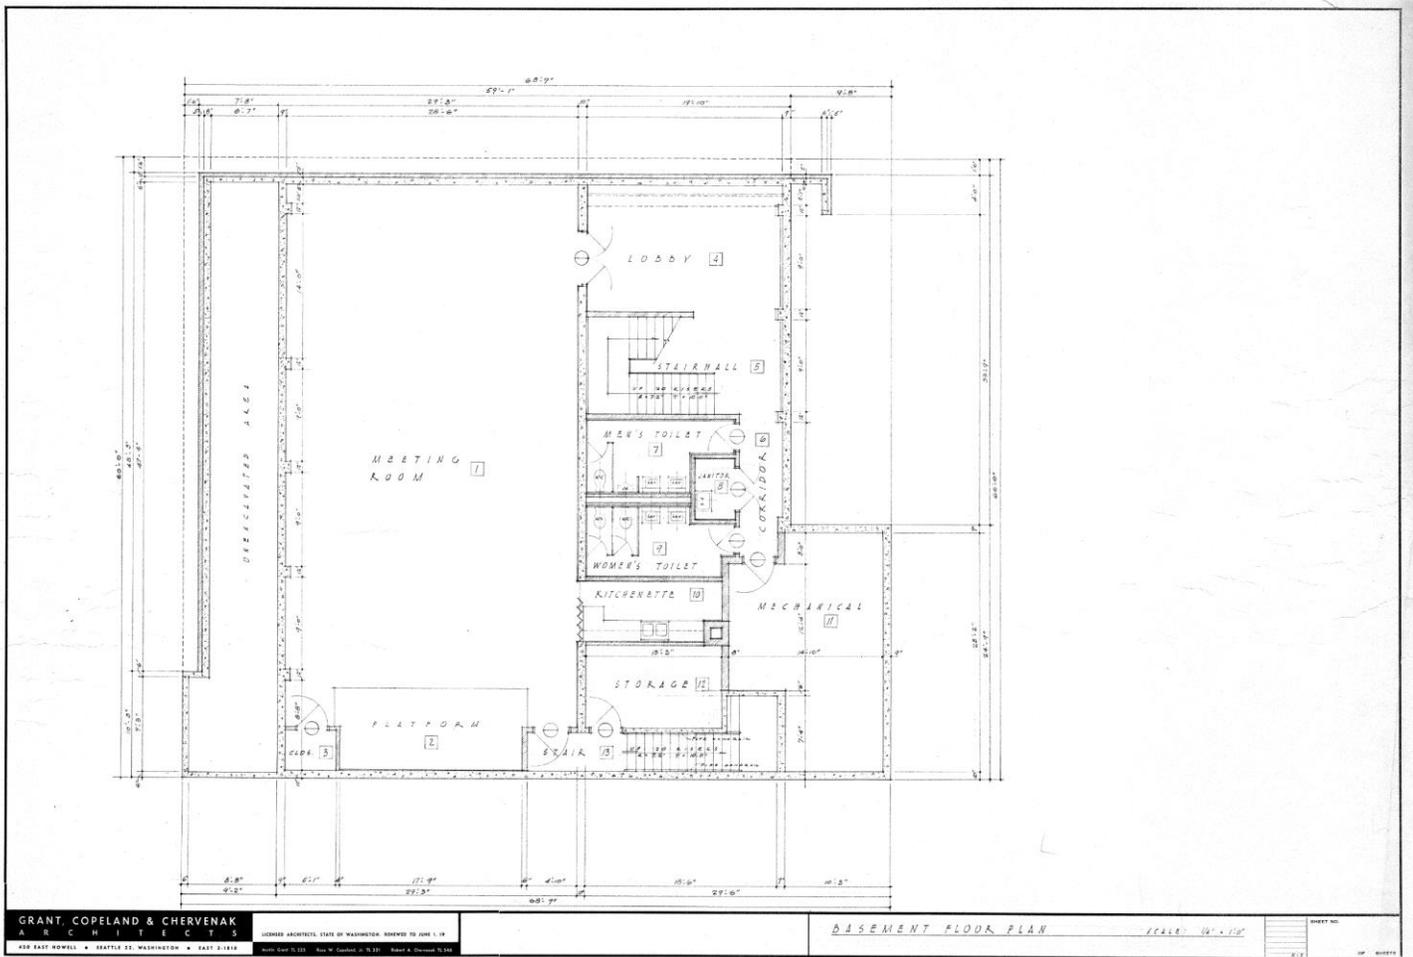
BASEMENT FLOOR PLAN (GRANT, COPELAND AND CHERVENAK, 1959)
